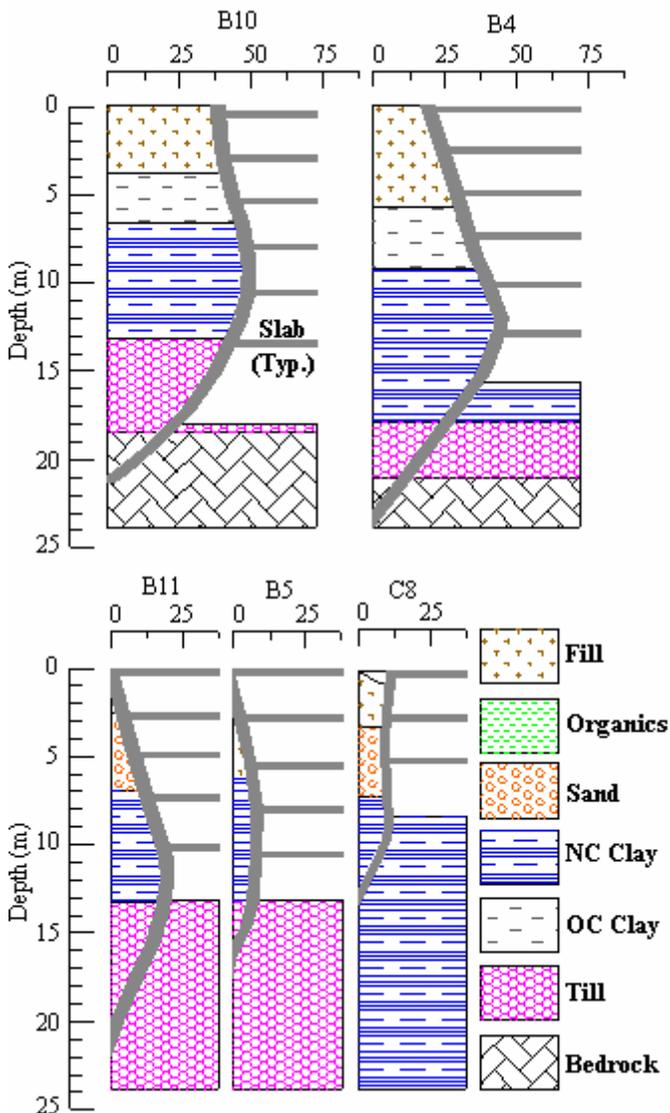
Typical sections and wall deformations  $\delta H$  (mm) for top-down excavations.
